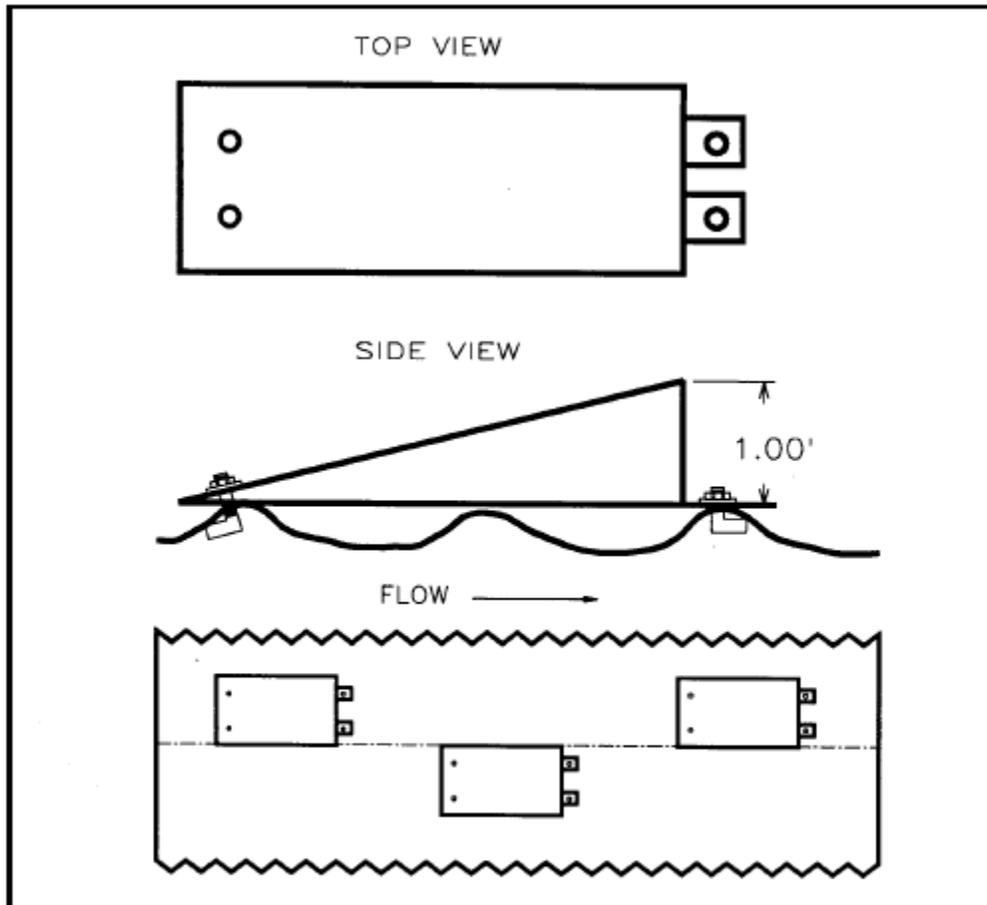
Corrugated metal pipe steel ramp baffles.
